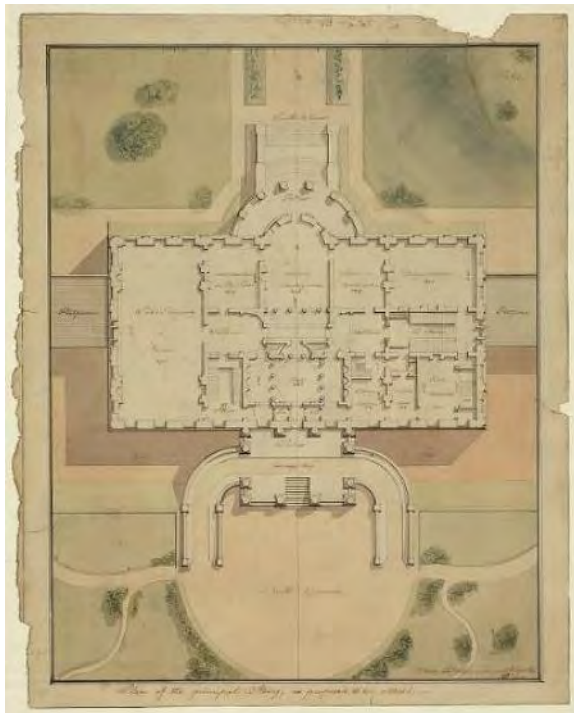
Latrobe. [United States Capitol, Washington, D.C. Elevation of west front with propylaea] / B.H. Latrobe Feb. 4, 1811. Latrobe. The White House, Washington, D.C. Site plan and principal story plan, architectural design. Wikimedia
